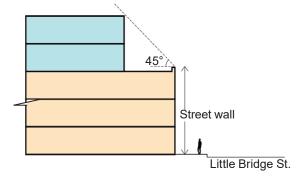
Approach to upper level setback along Little Bridge Street and Curtis Street
